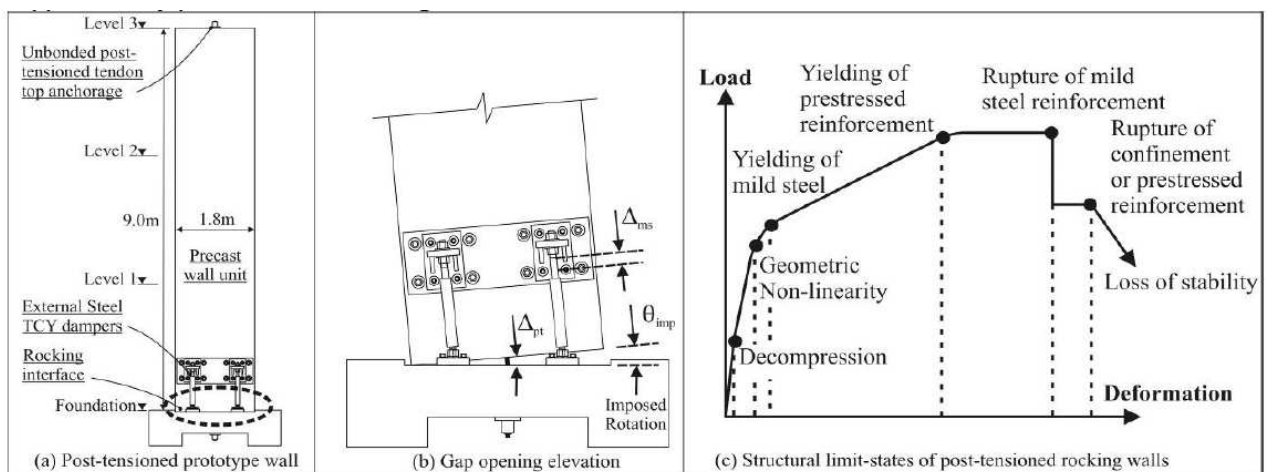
Post-tensioned precast rocking wall system with externally mounted mild steel dampers [1.24]
